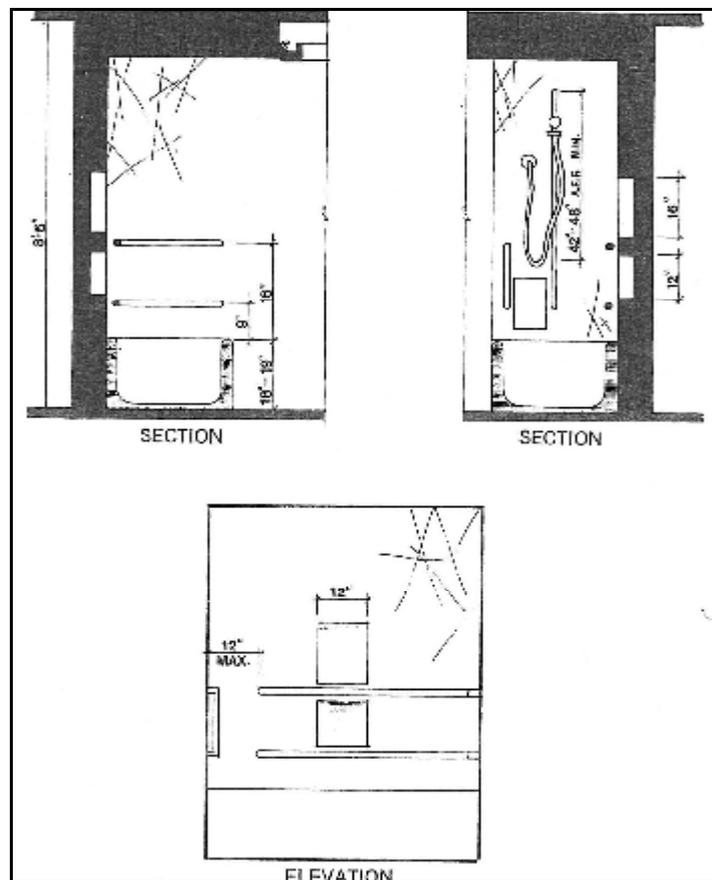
Bathroom section and elevations of typical guestrooms. (BAUCOM, 1996, 221).
